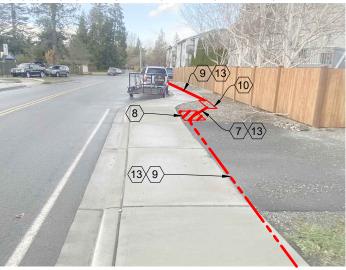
FACING EAST ON THE NORTH SIDE OF S NEWTON ST.
